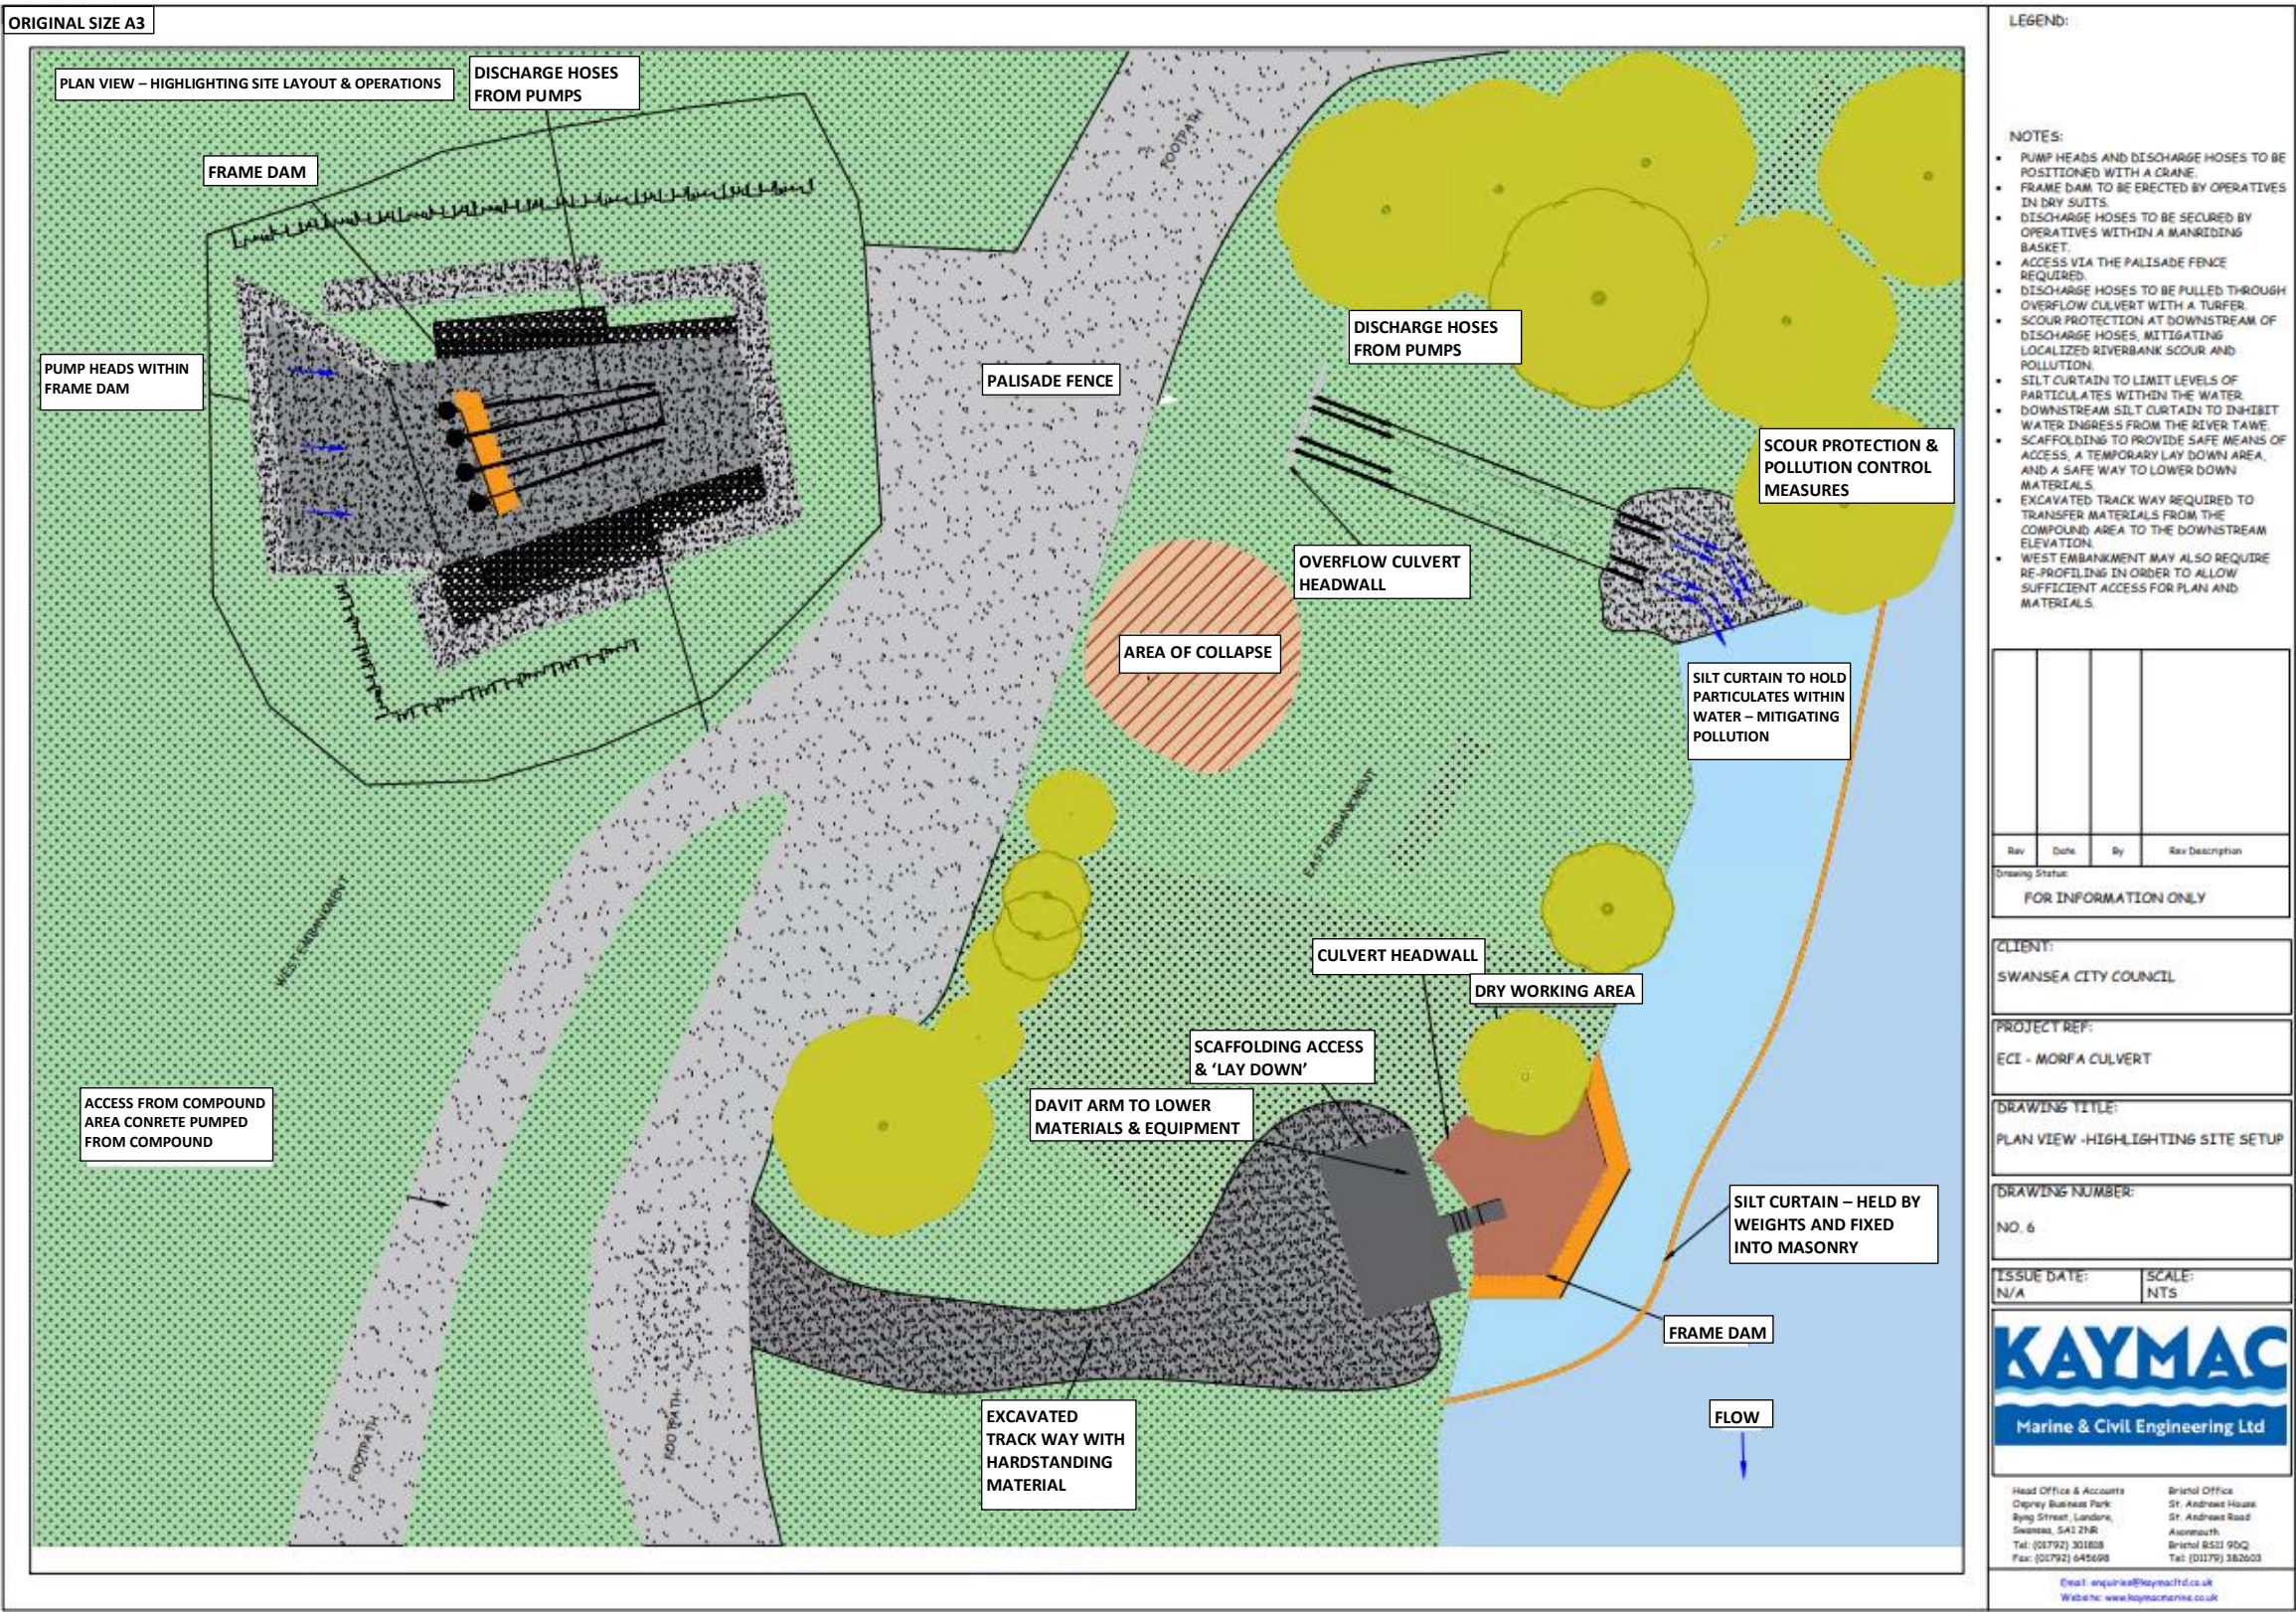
Plan view of both in-water and ‘dry’ proposed works provided by Kaymac (2023).
